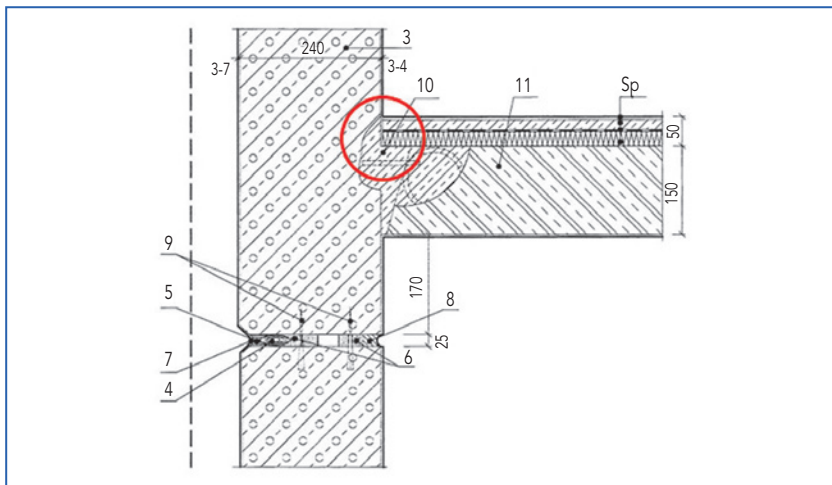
Detail of floor junction in T06B-NR system, [9].
